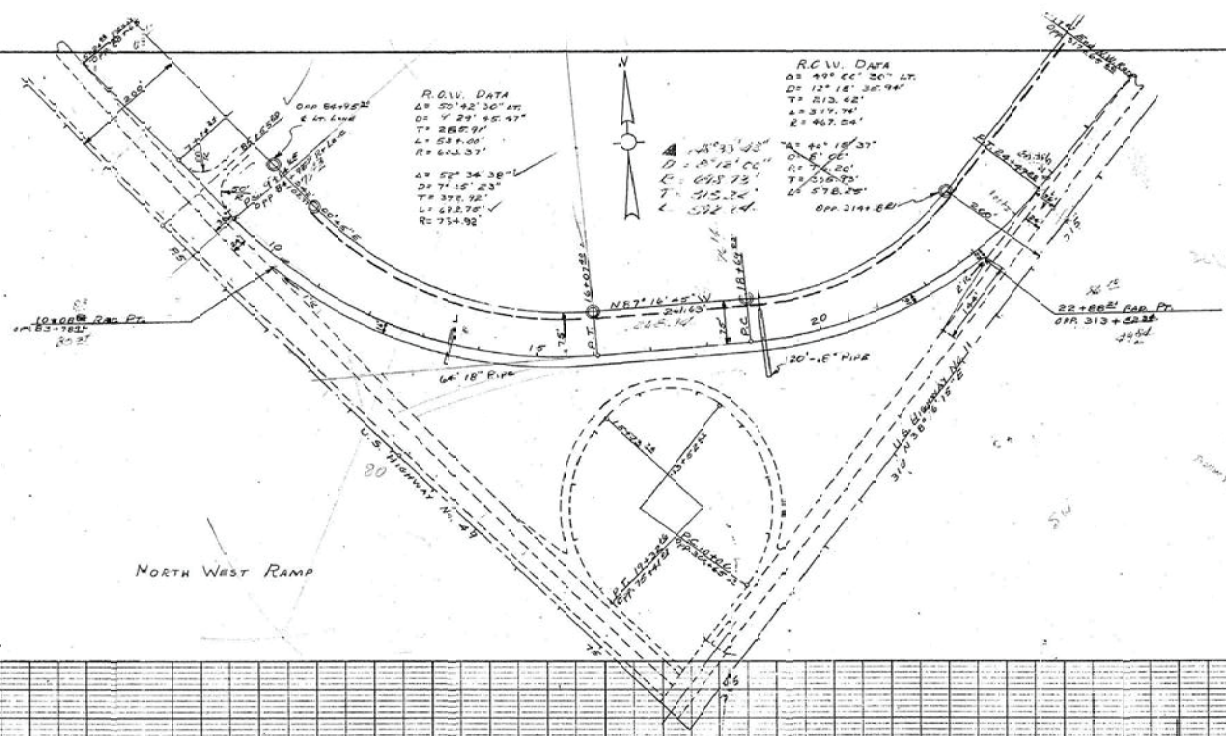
PLAN - PROFILE G. H. & R. STANHOPE
